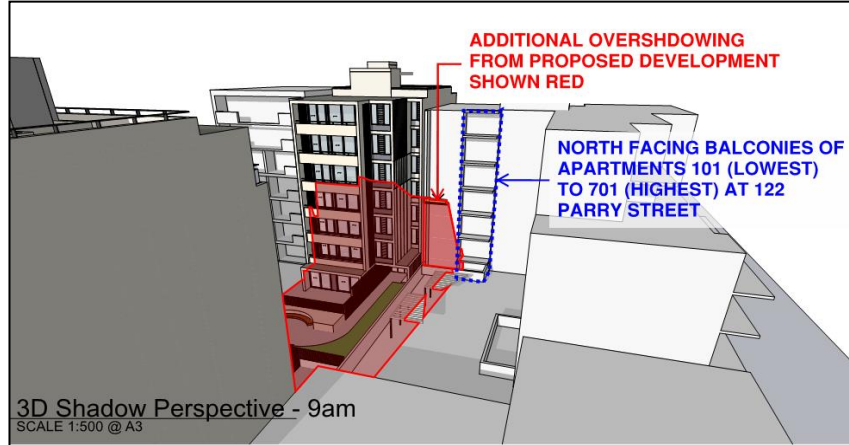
Shadow diagram 9AM - markup showing overshadowing of proposed development on north facing balconies of neighbouring apartment development at 122 Parry Street (extract from *Additional Information*, drawing no: DA-603, issue no: A, dated 22/7/2021)
